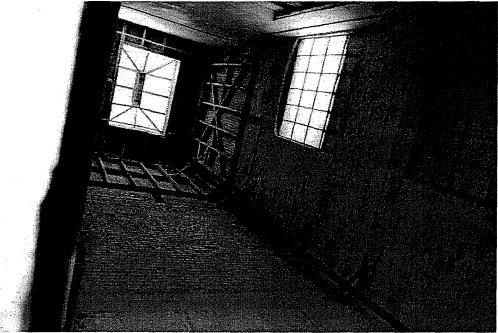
Interior shaft space at southeast corner of building. Second-story window at south façade picture right. Skylight at roof level pictured left. Facing south.
